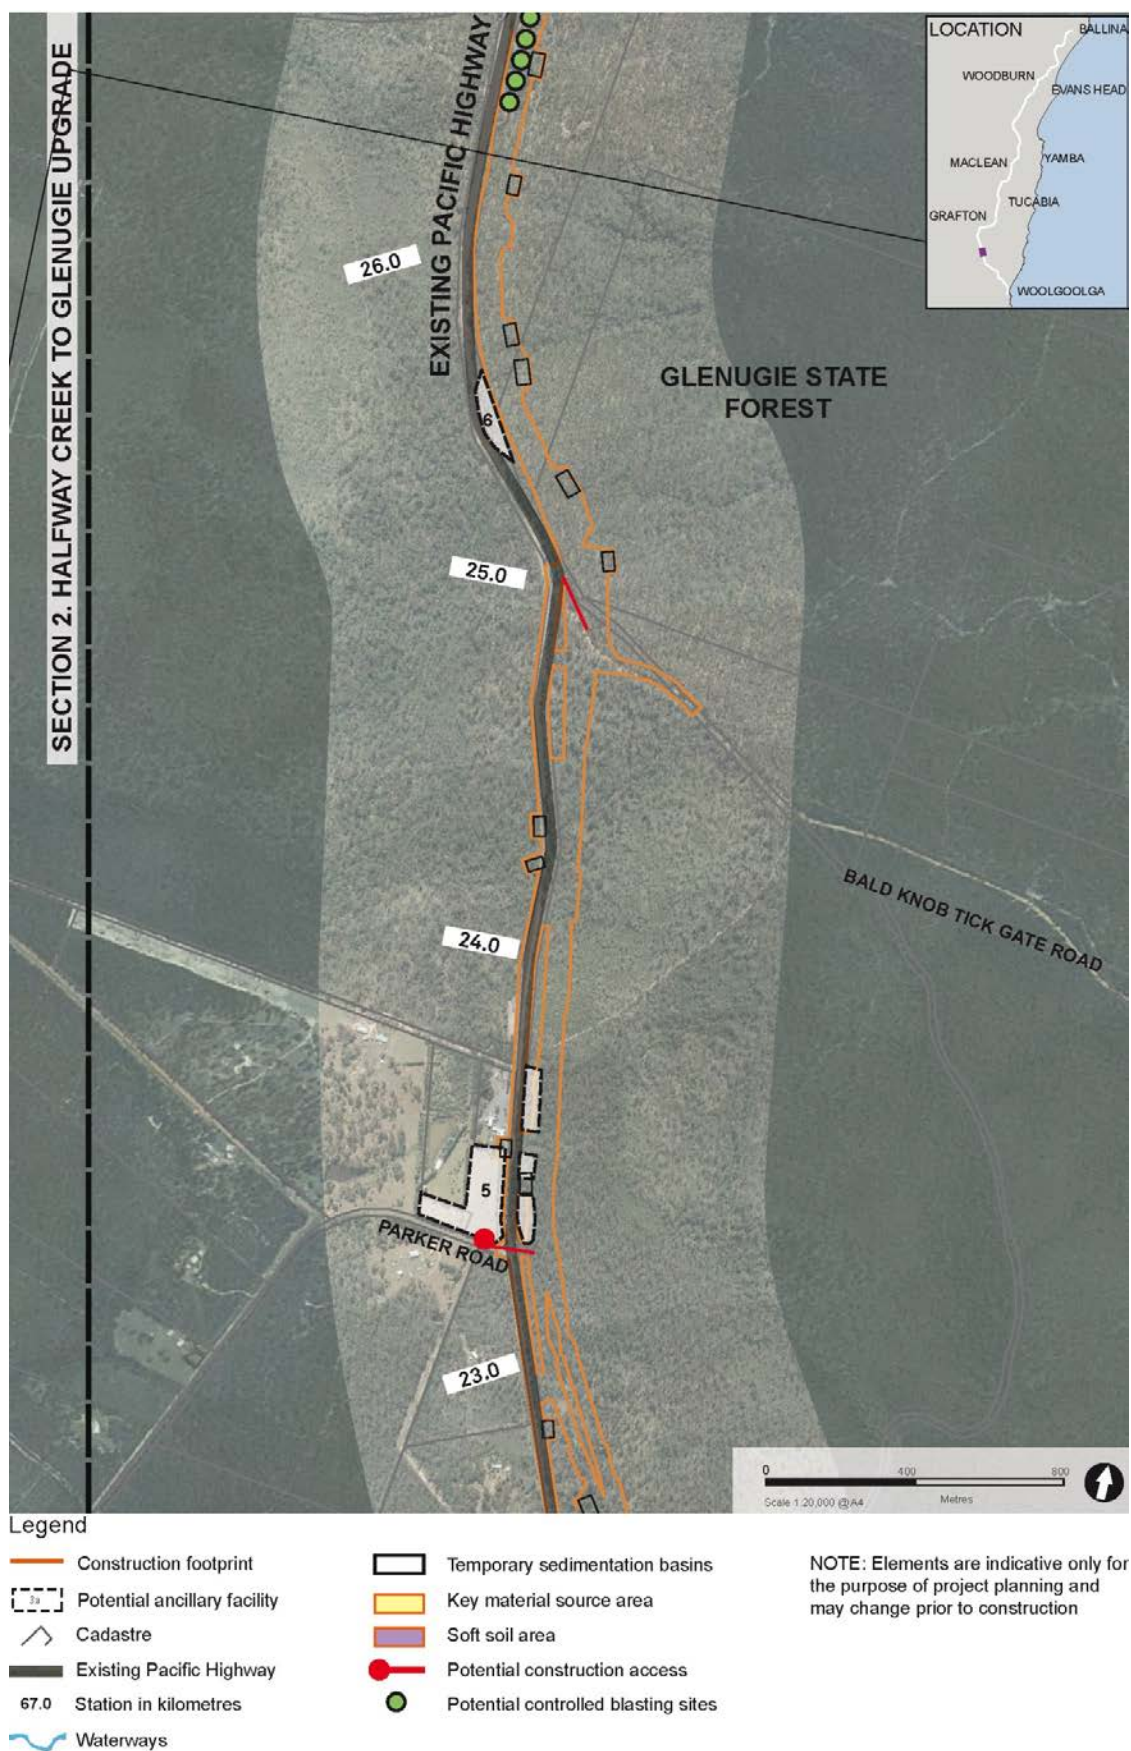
Extent of construction and construction features Section 2 (Station 22.9 to 26.8)
